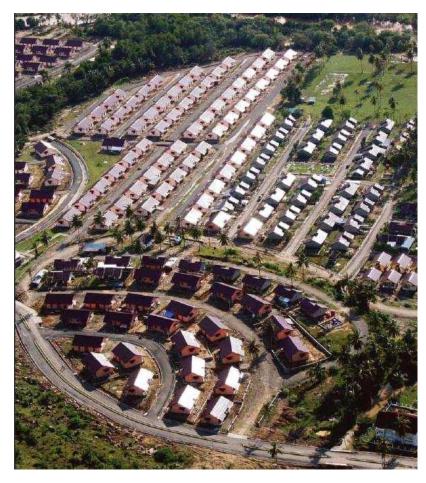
Example of an ideal housing plan that could only be implemented on a new (undeveloped) site (source: BRR Book Series: Housing, 2009)
